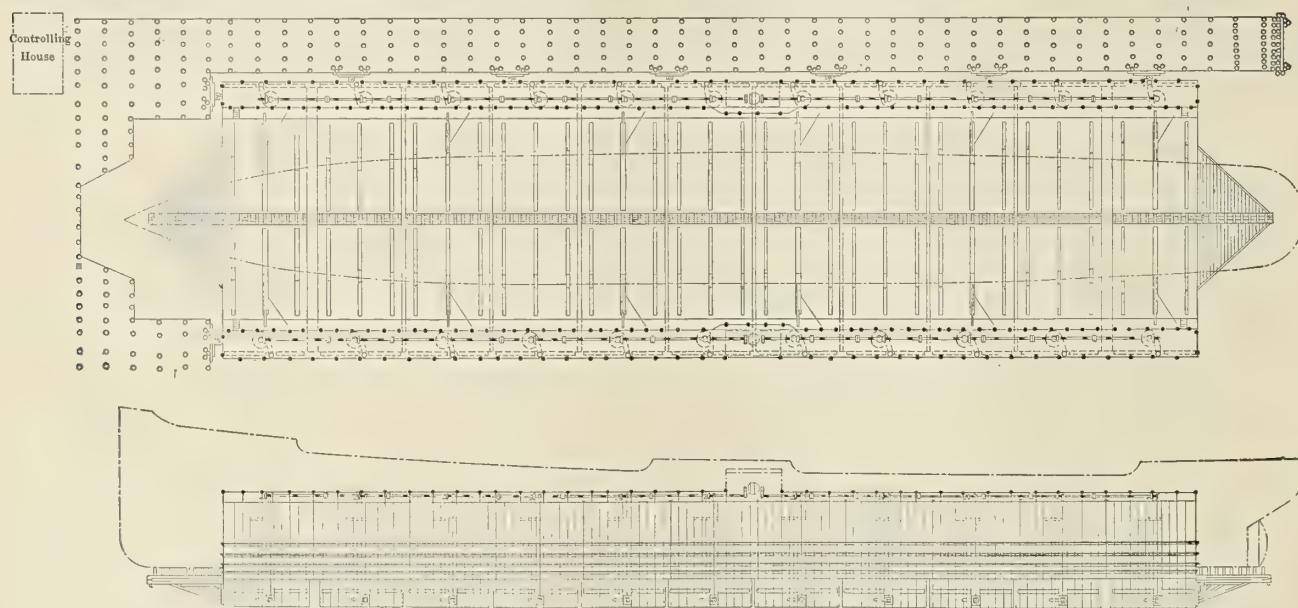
PLAN AND ELEVATION OF THE DOCK.
